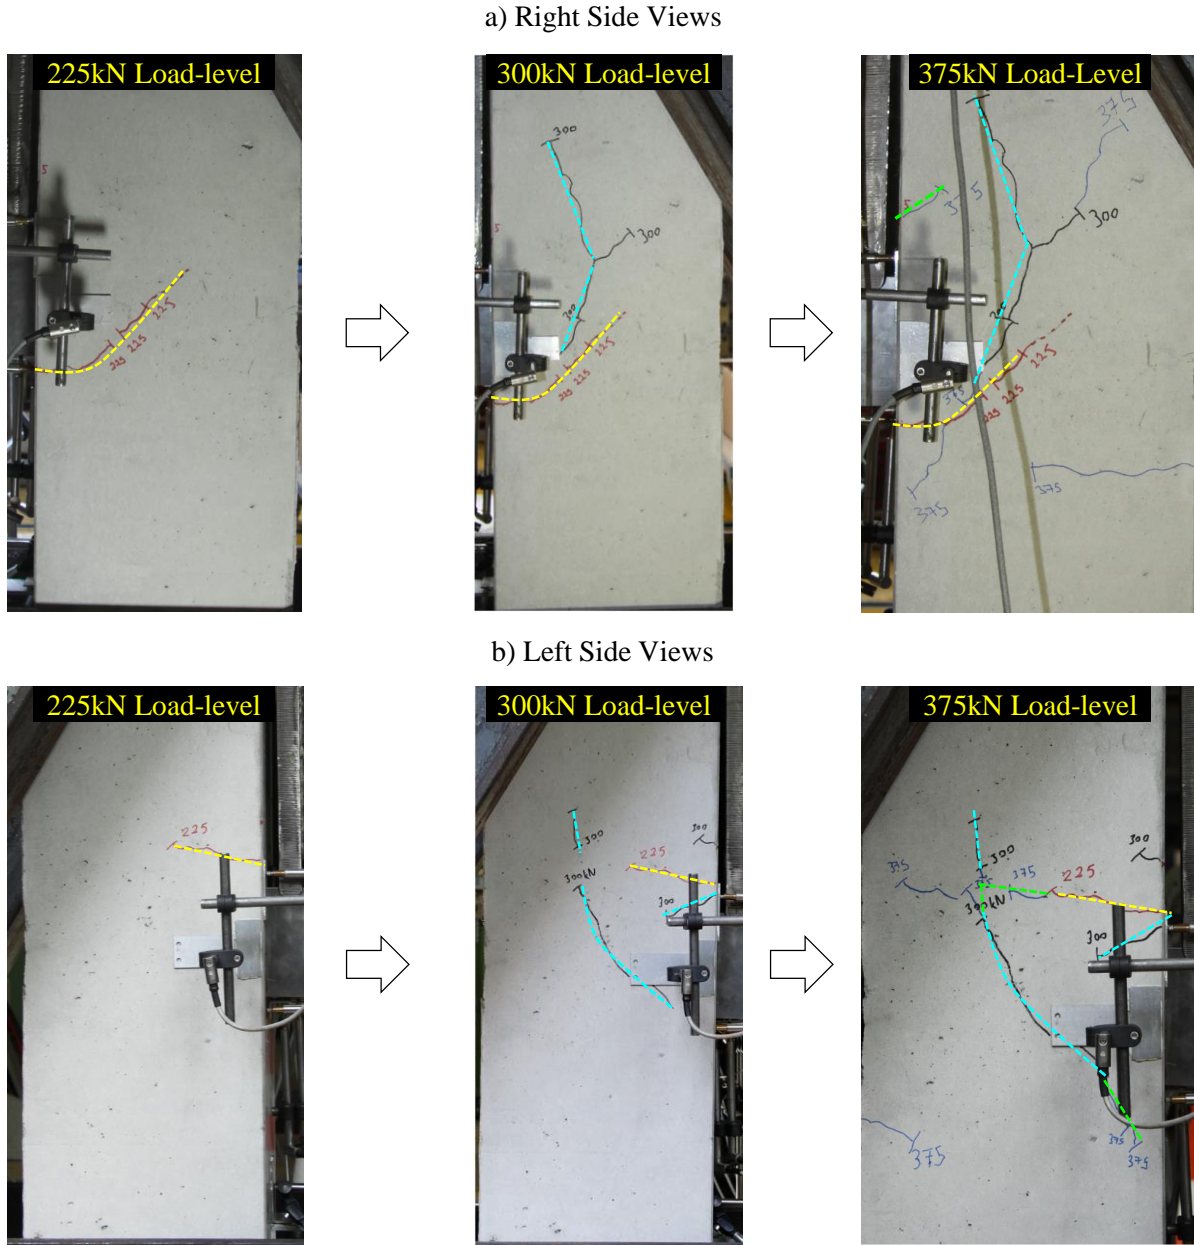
Development of concrete-cone and pry-out failure modes / CC-01.
